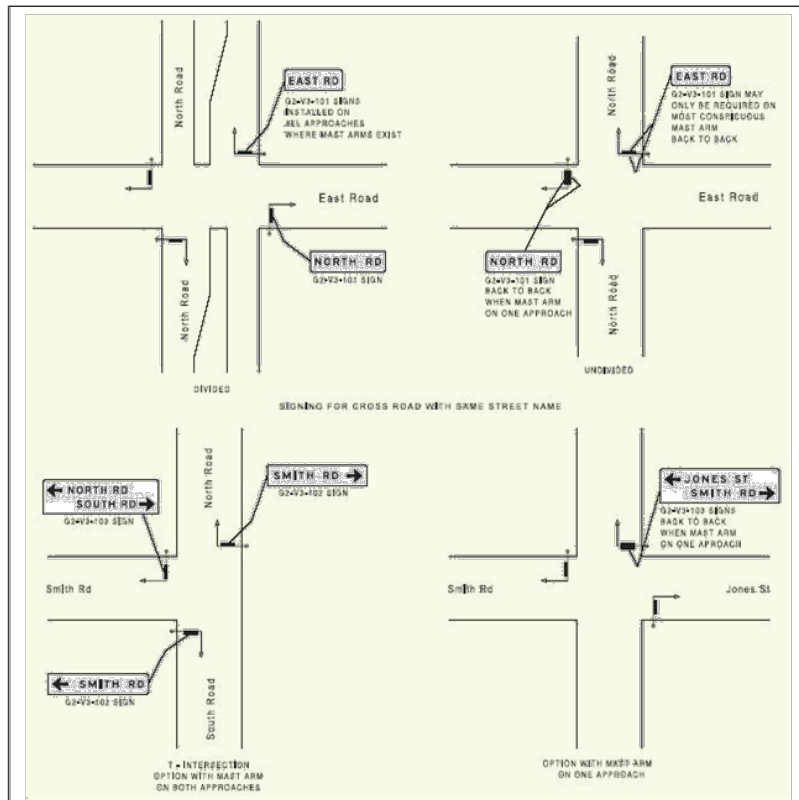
TYPICAL EXAMPLES FOR G2-V3 MAST ARM MOUNTED STREET NAME SIGNS
